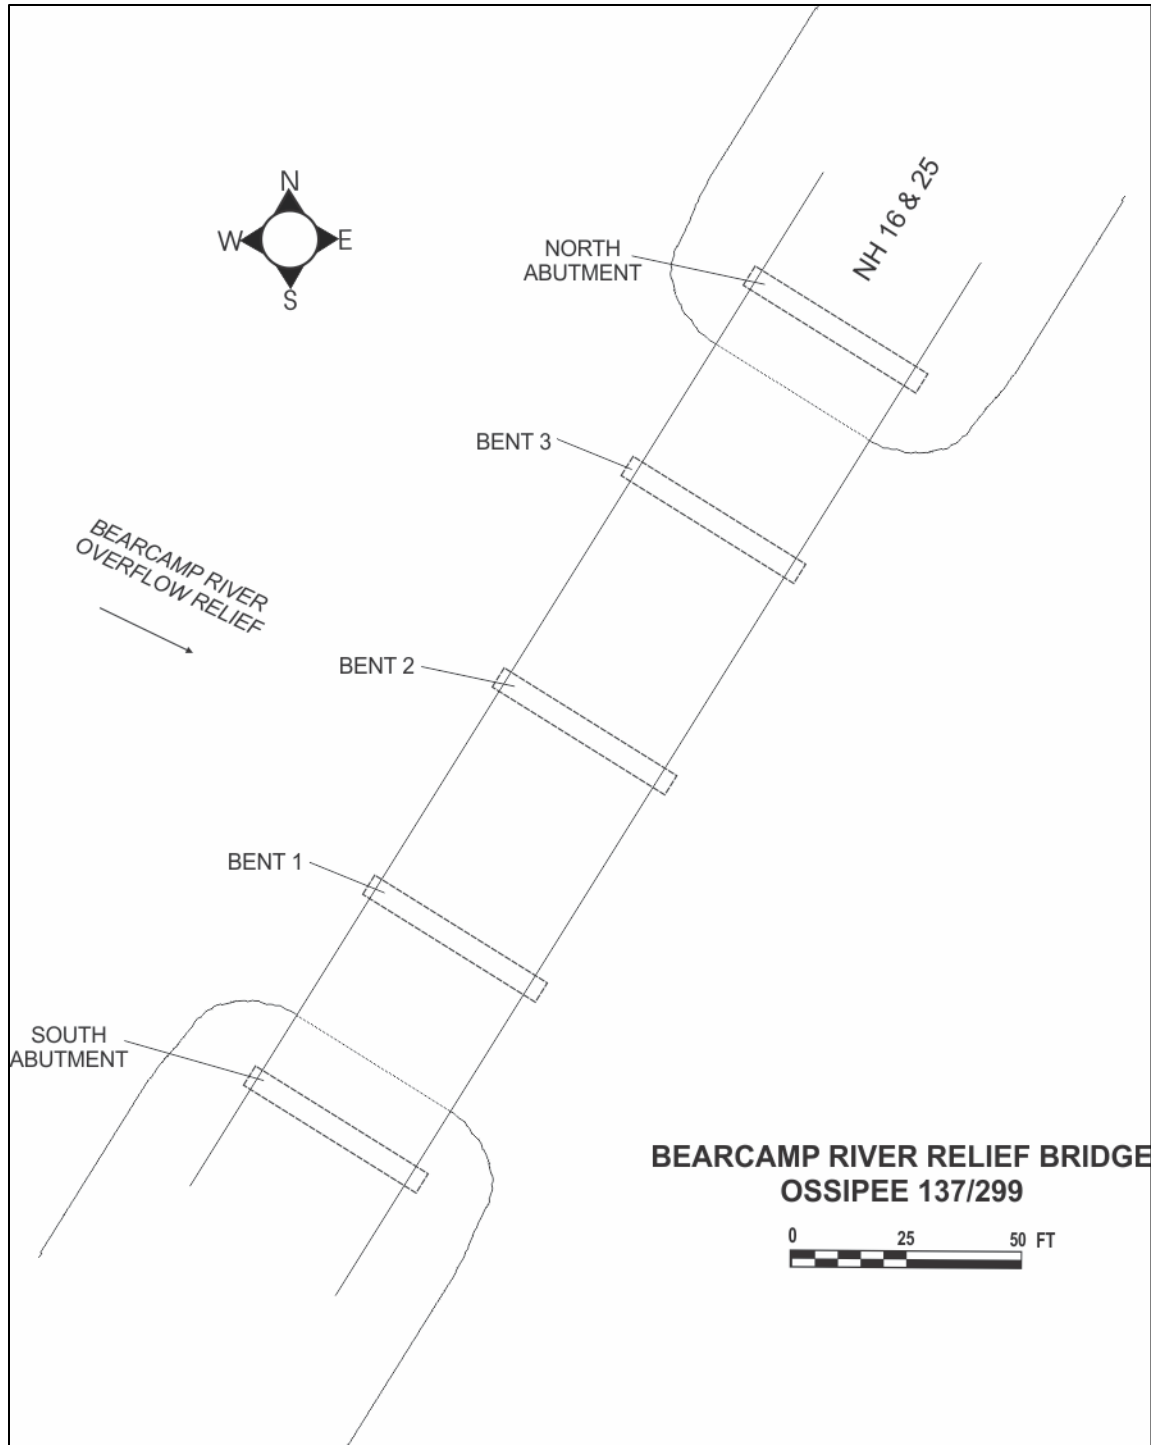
Bearcamp River Relief Bridge, Site Sketch
